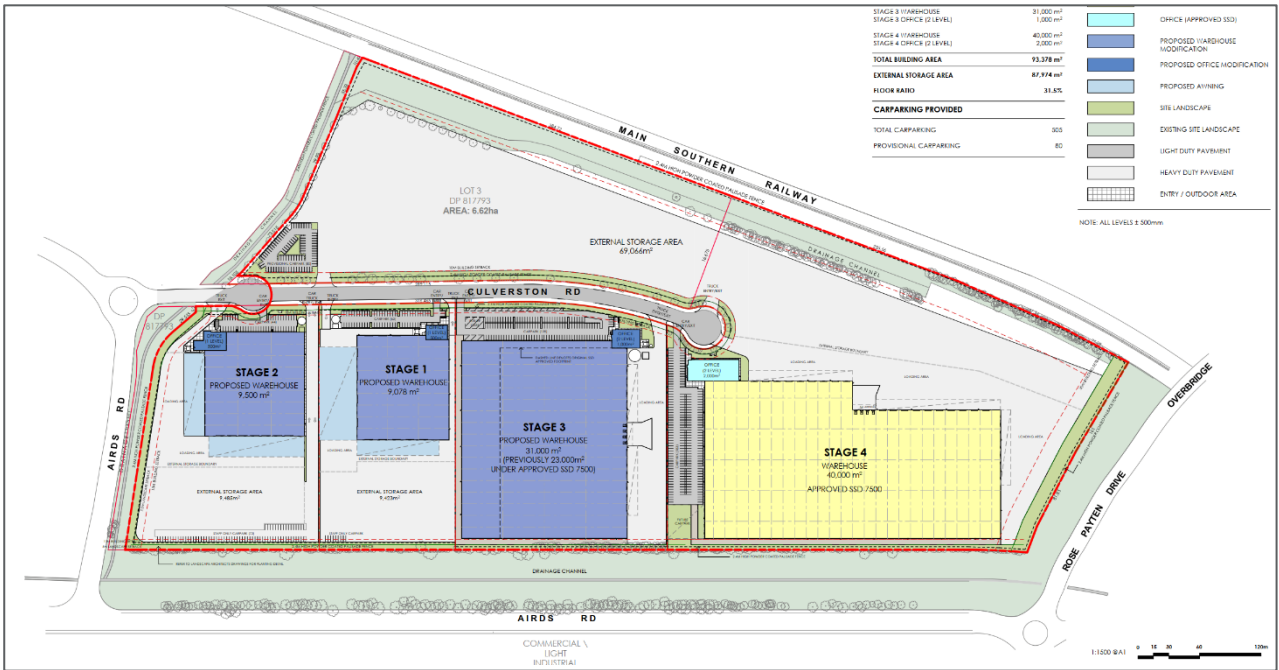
Proposed Architectural Site Plan (drawing CH2CUL – A – 04, revision B, by Watch This Space Design, dated 24/09/2021)
